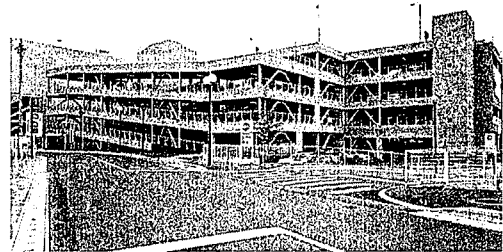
Multistory parking constructed of FR steel (SATY Kamimine Shop)
